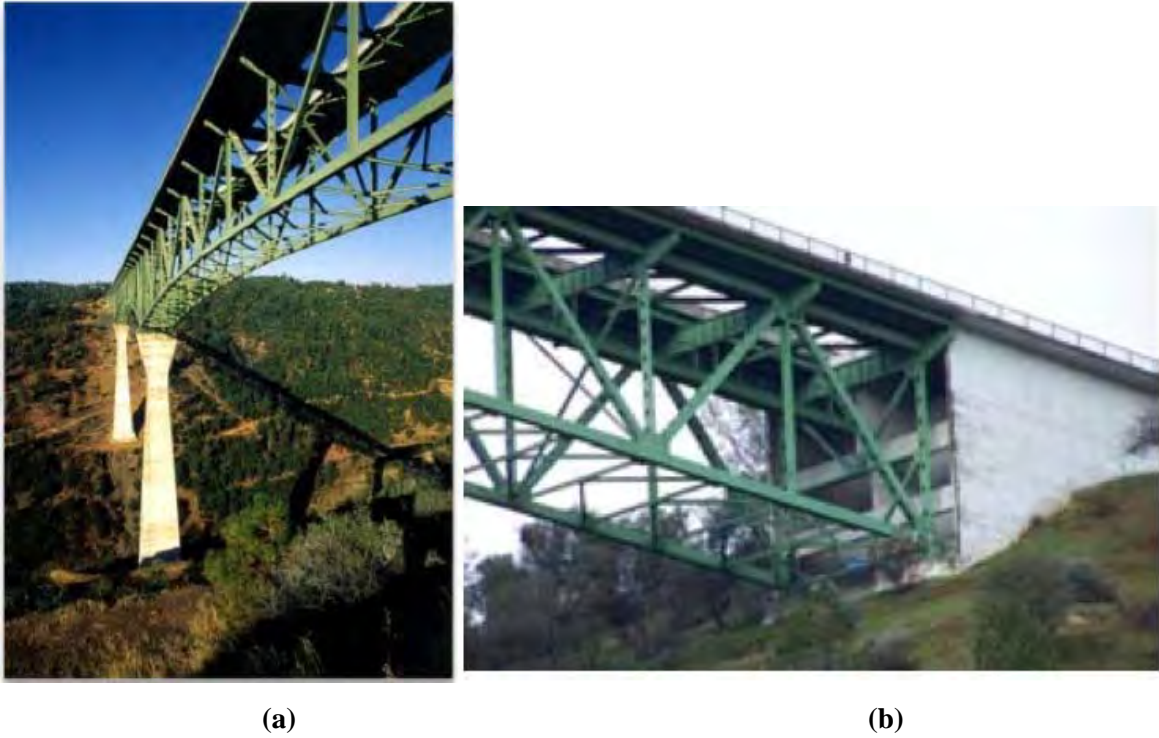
Auburn-Foresthill Road Bridge: (a) general view of the deck truss; (b) abutment (Reno and Pohll, 2010b)
